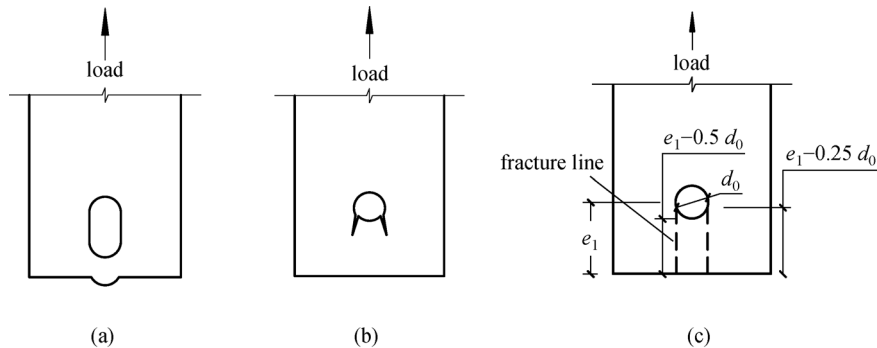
Two failure modes and geometric parameter. (a) Bearing; (b) tearout; (c) geometry.
